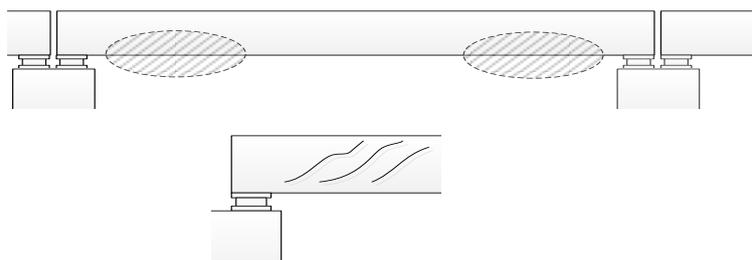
Shear Cracking at L/4 of Span of Girder
